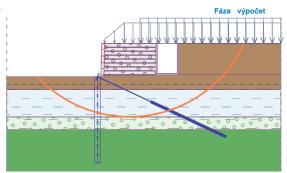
An example of determining global stability for part of a construction with a reinforced structure
